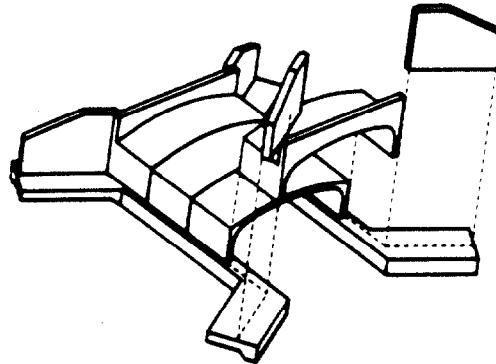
CON/SPAN™ culvert system.<sup>(8)</sup>
